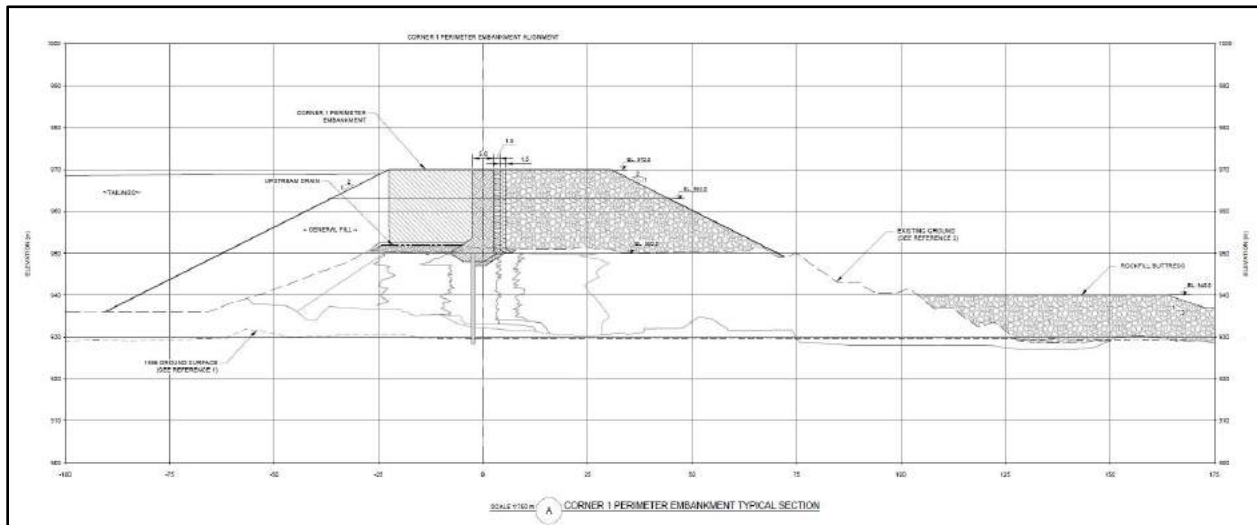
TSF Showing 950m Repair Embankment Relative to the 968.5m Embankments
